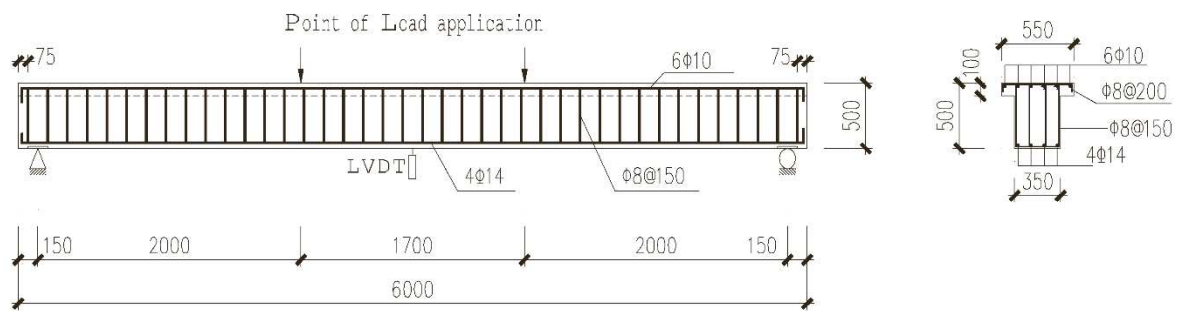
Load configuration and the detail of as-built beams tested by Zhou et al. [29]
